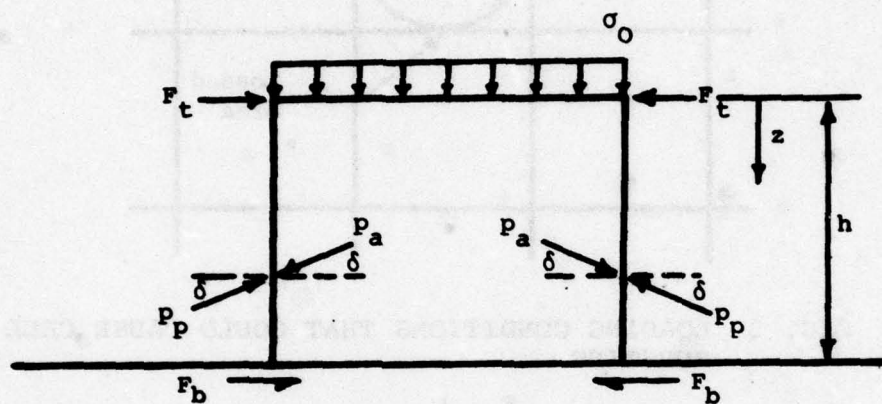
LOADING CONDITIONS THAT COULD CAUSE CELL BURSTING
